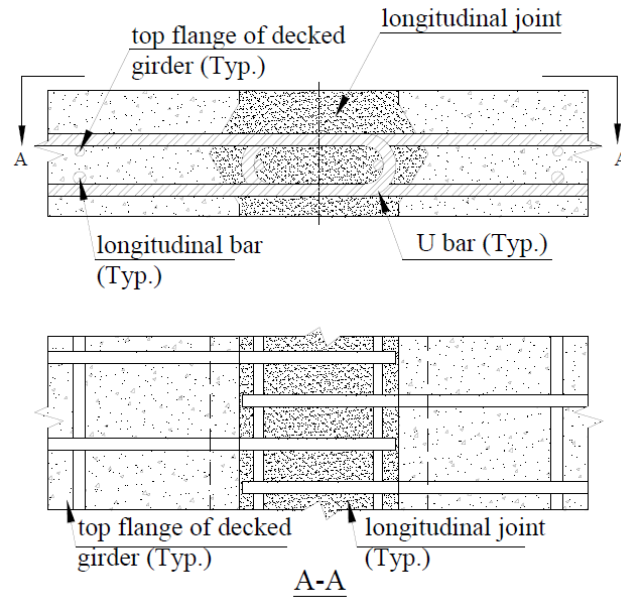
Proposed U-bar connection detail (French, et al., 2011)
